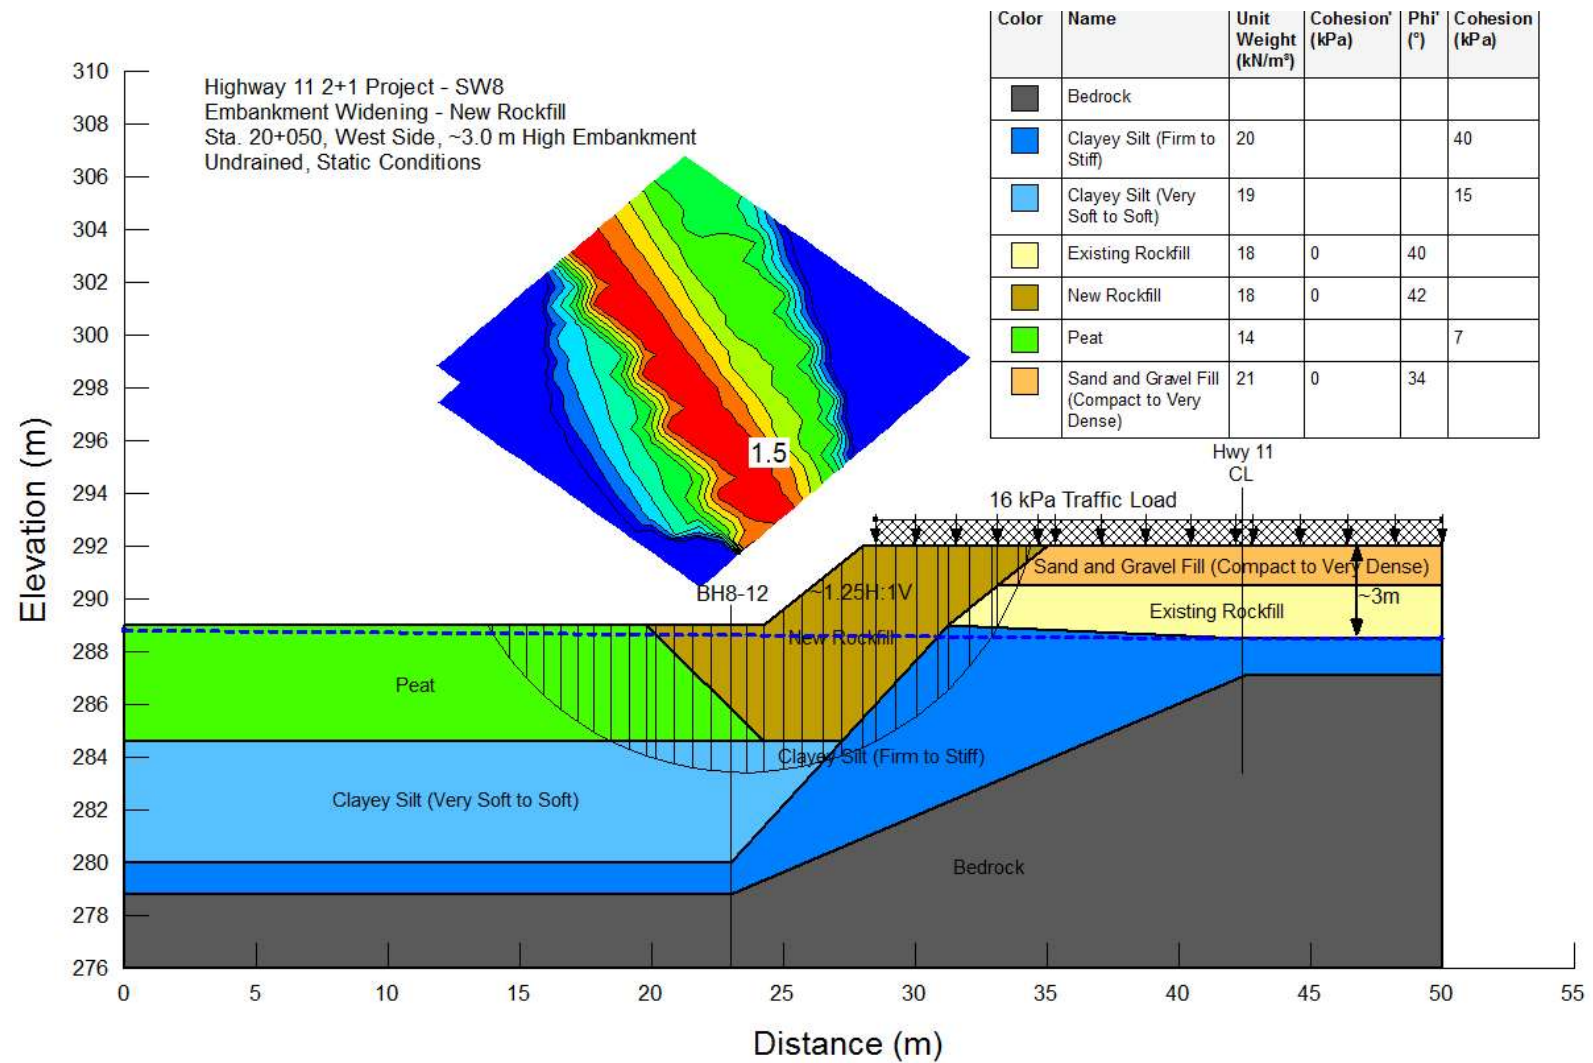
Slope stability analysis for embankment widening at Sta. 20+050, west side (~3 m high) – Rockfill (1.25H:1V) – undrained, static condition
